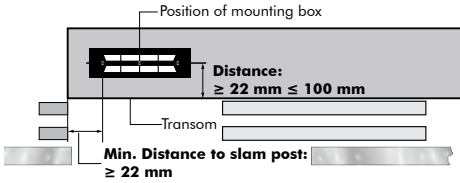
Position of the mounting box on the transom (right side-opening doors)
